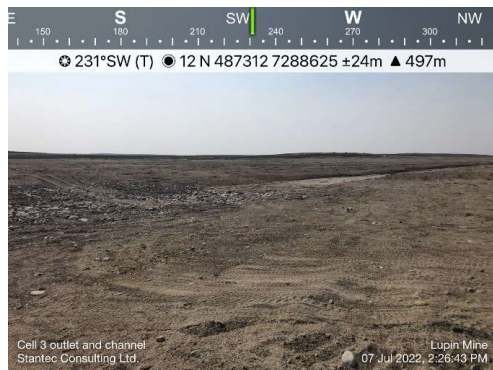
Looking southwest at the Cell 3 outlet and surface channel.
